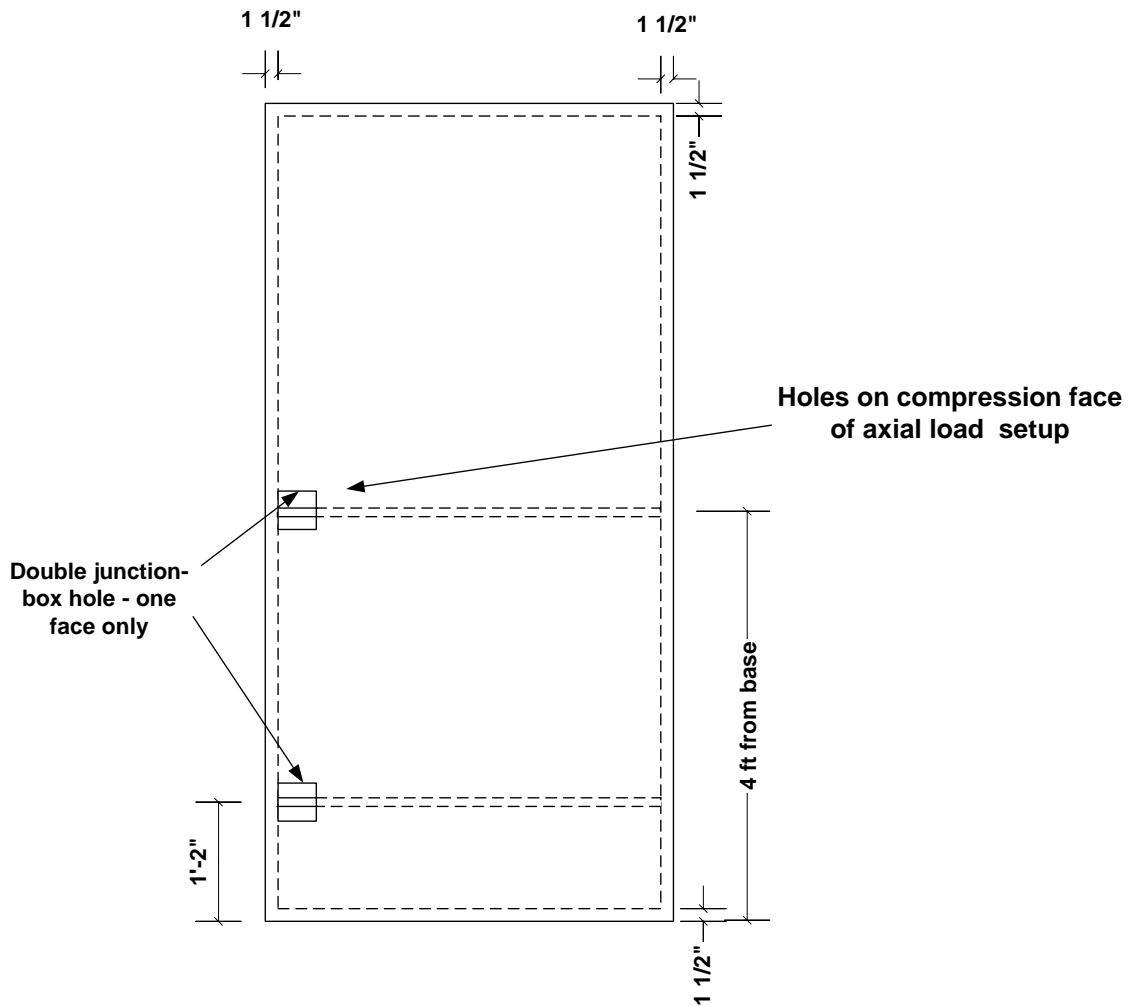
AXIAL (COMPRESSION) LOAD TEST SPECIMEN AND ASSEMBLY
